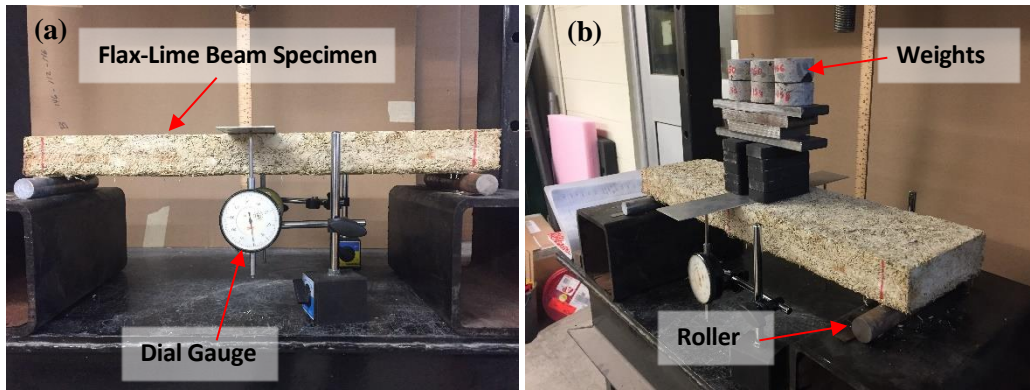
bending test setup photos: (a) before loading; and (b) loaded specimen.
